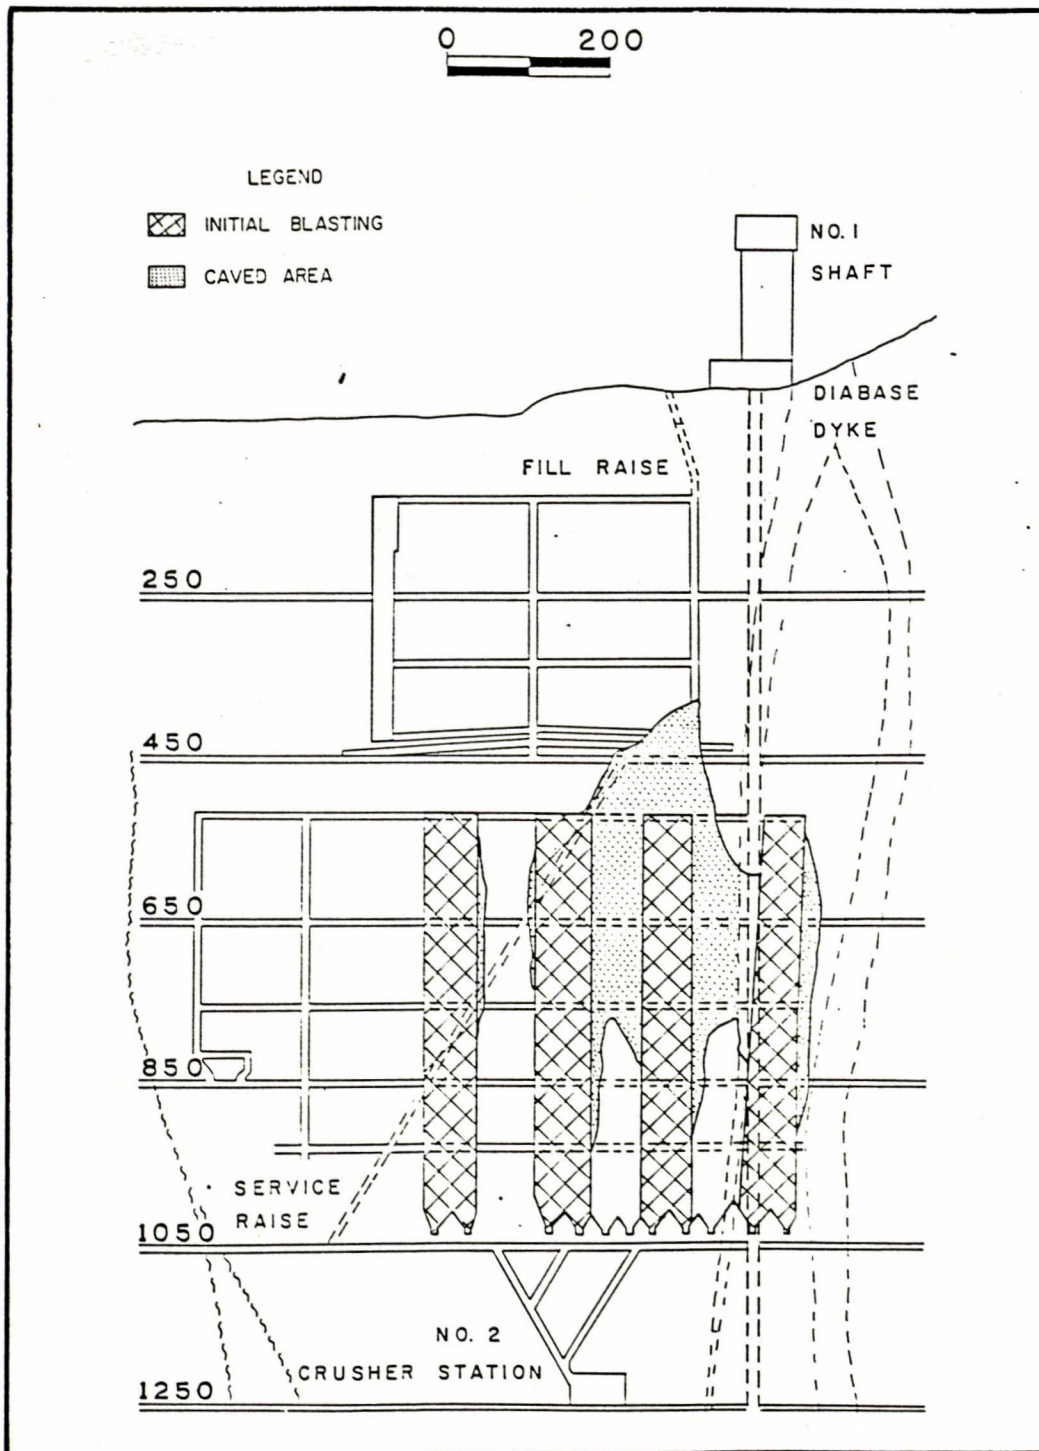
Longitudinal section of blasthole stoping, with pillar collapse.
